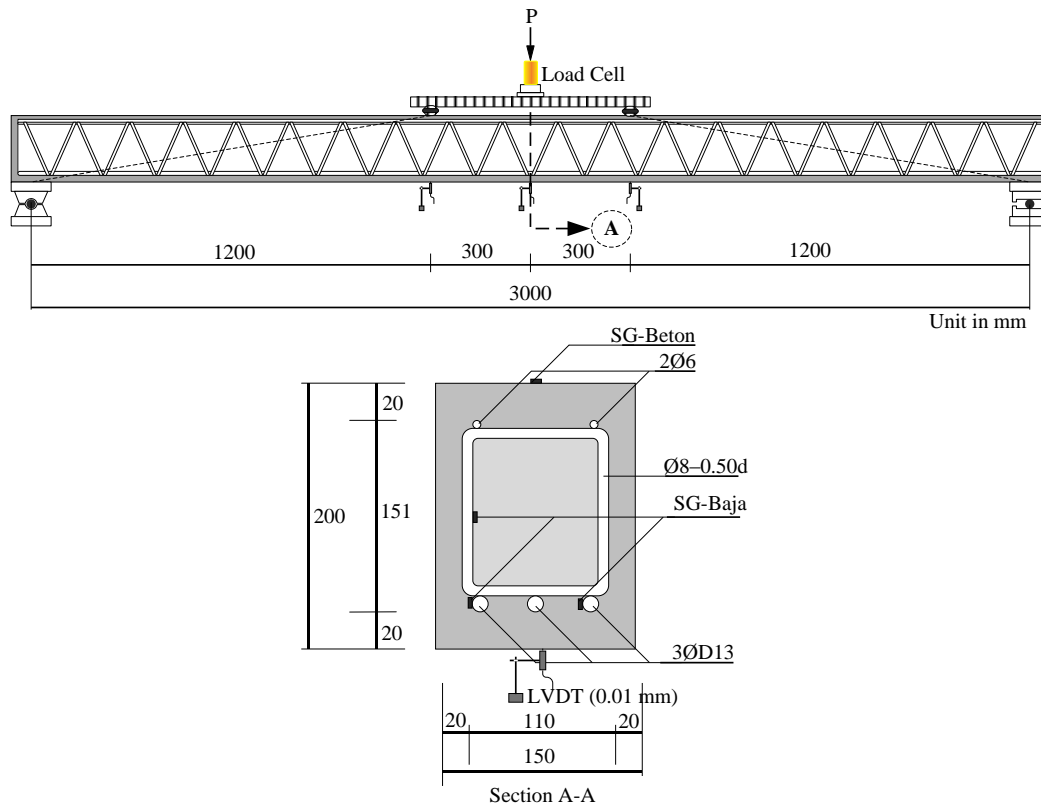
Detail of beams with truss system reinforcement (BTR)
